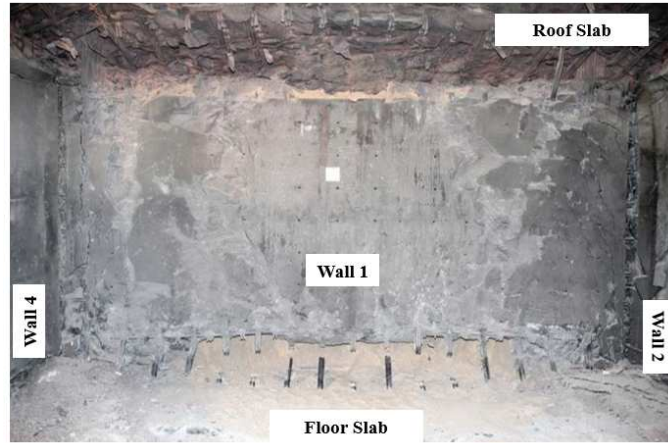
Interior face of the donor panel of Wall 1 after test [8]
